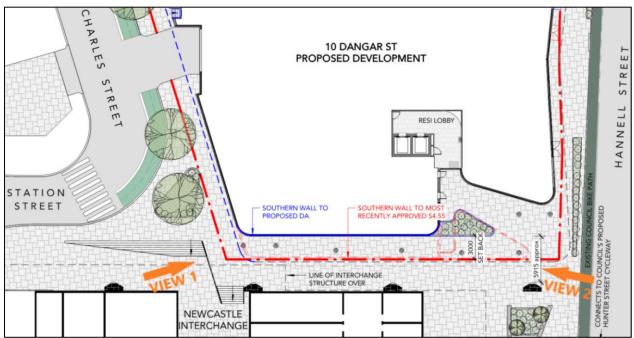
Extract of 'Ground Floor Public Domain Plan' (source: Team 2 Architects)
